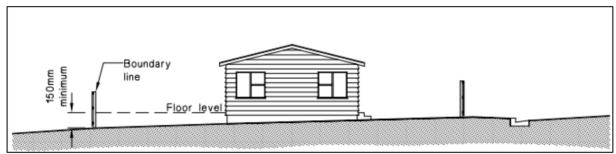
Minimum Floor Level for Site Below Road (Figure 2 Acceptable Solution E1/AS1)
